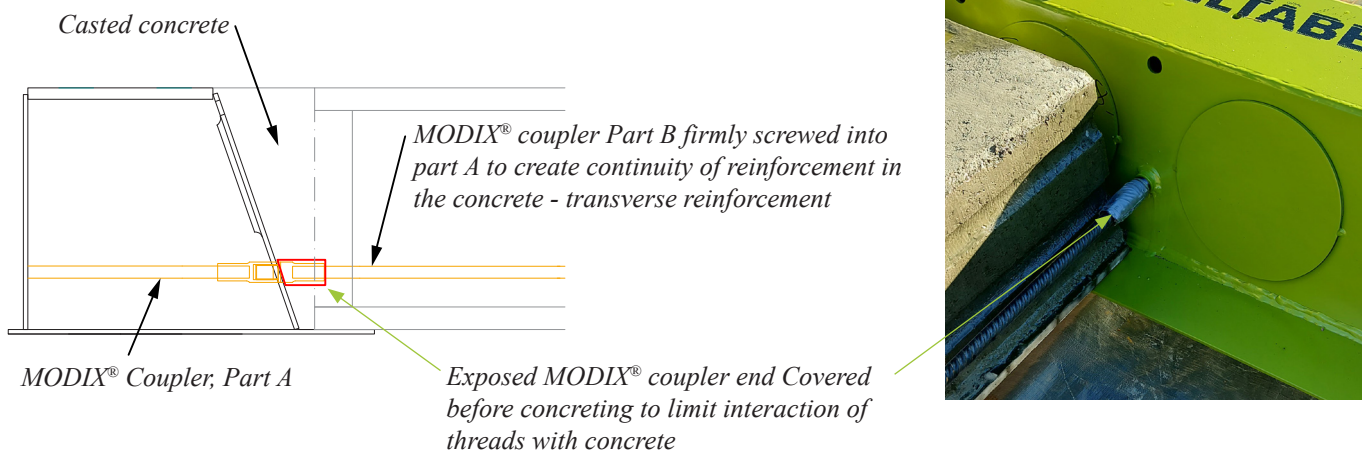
Using MODIX® Rebar coupler for transverse reinforcement.
